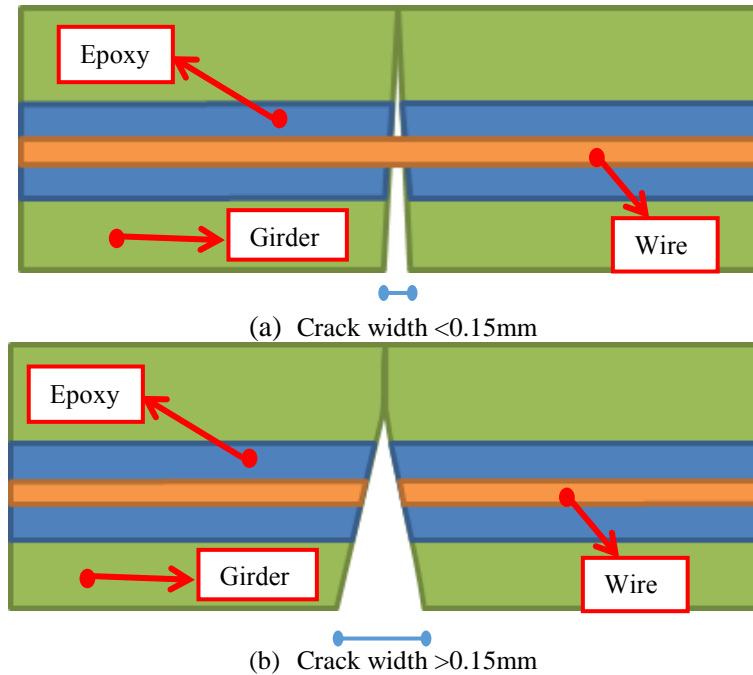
Girder, Crack, Wire&Epoxy (a) before crack opens to 0.15mm, (b) after crack opens more than 0.15 mm[8]
